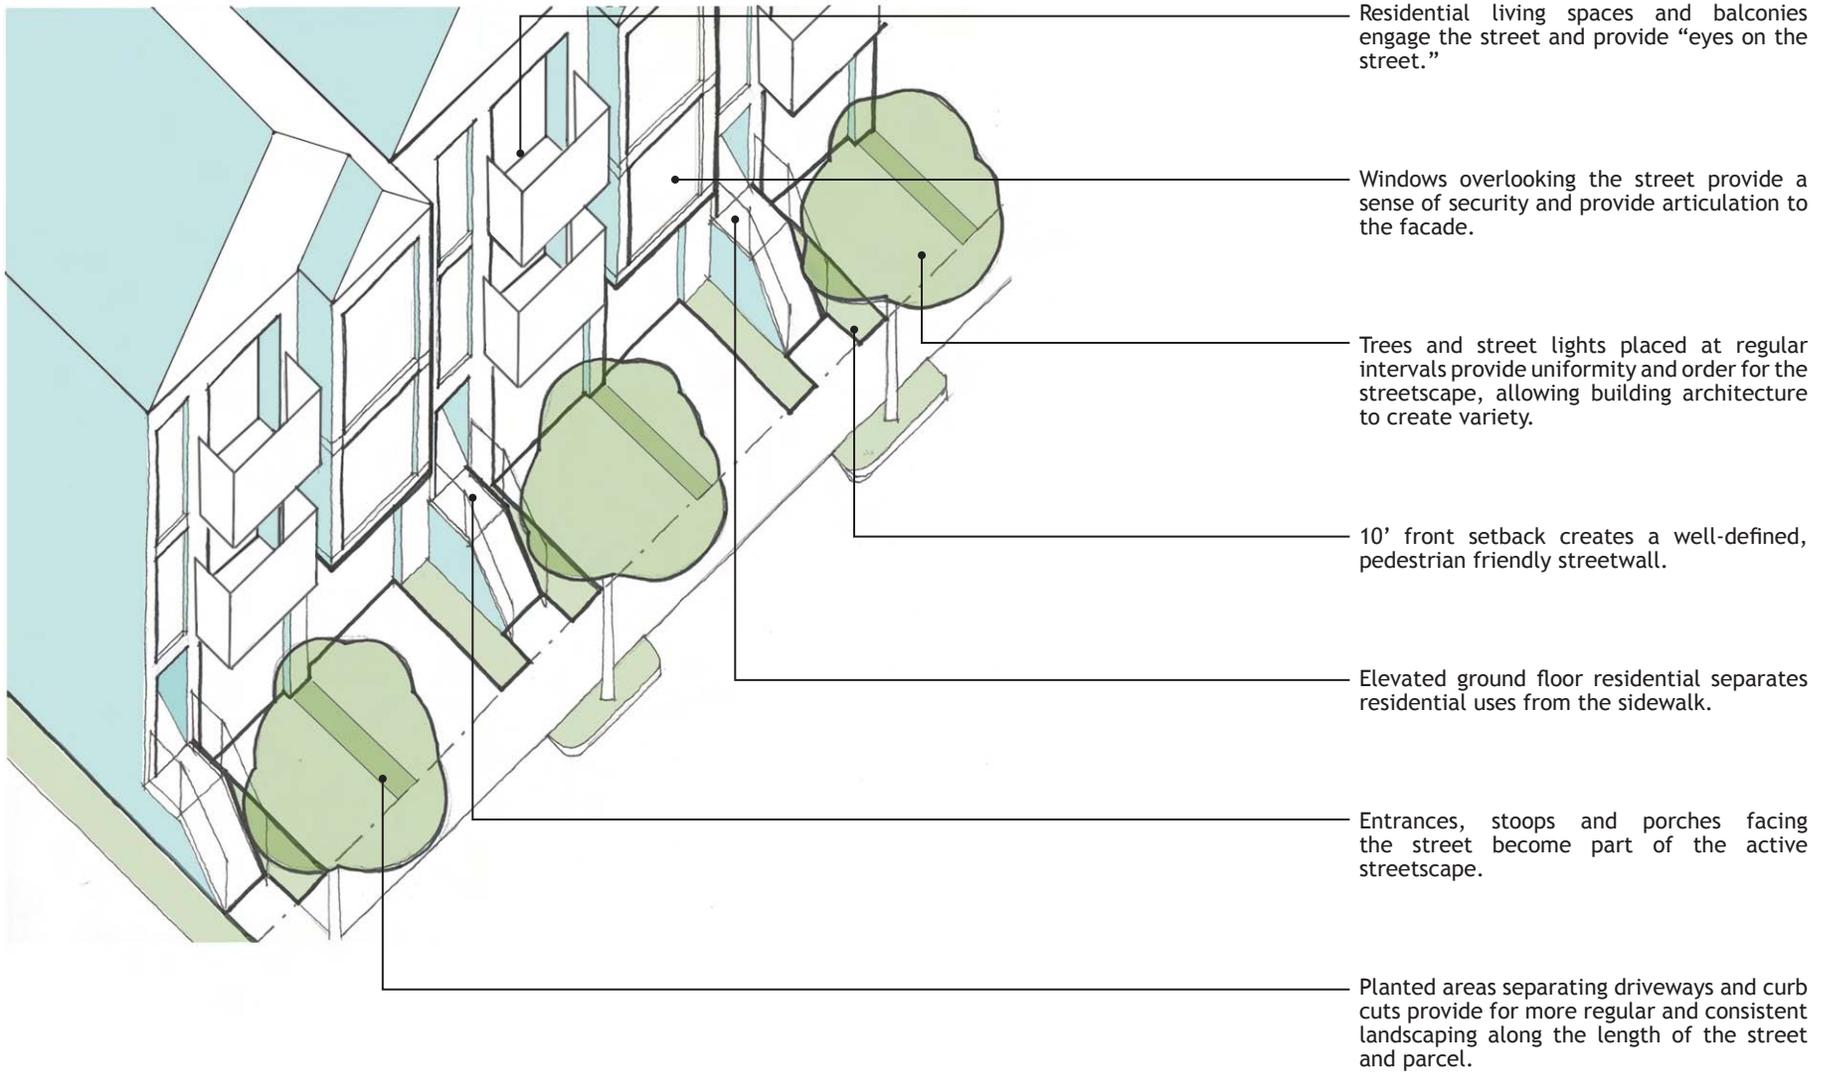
Residential townhouse building fronting Downtown Neighborhood Street
